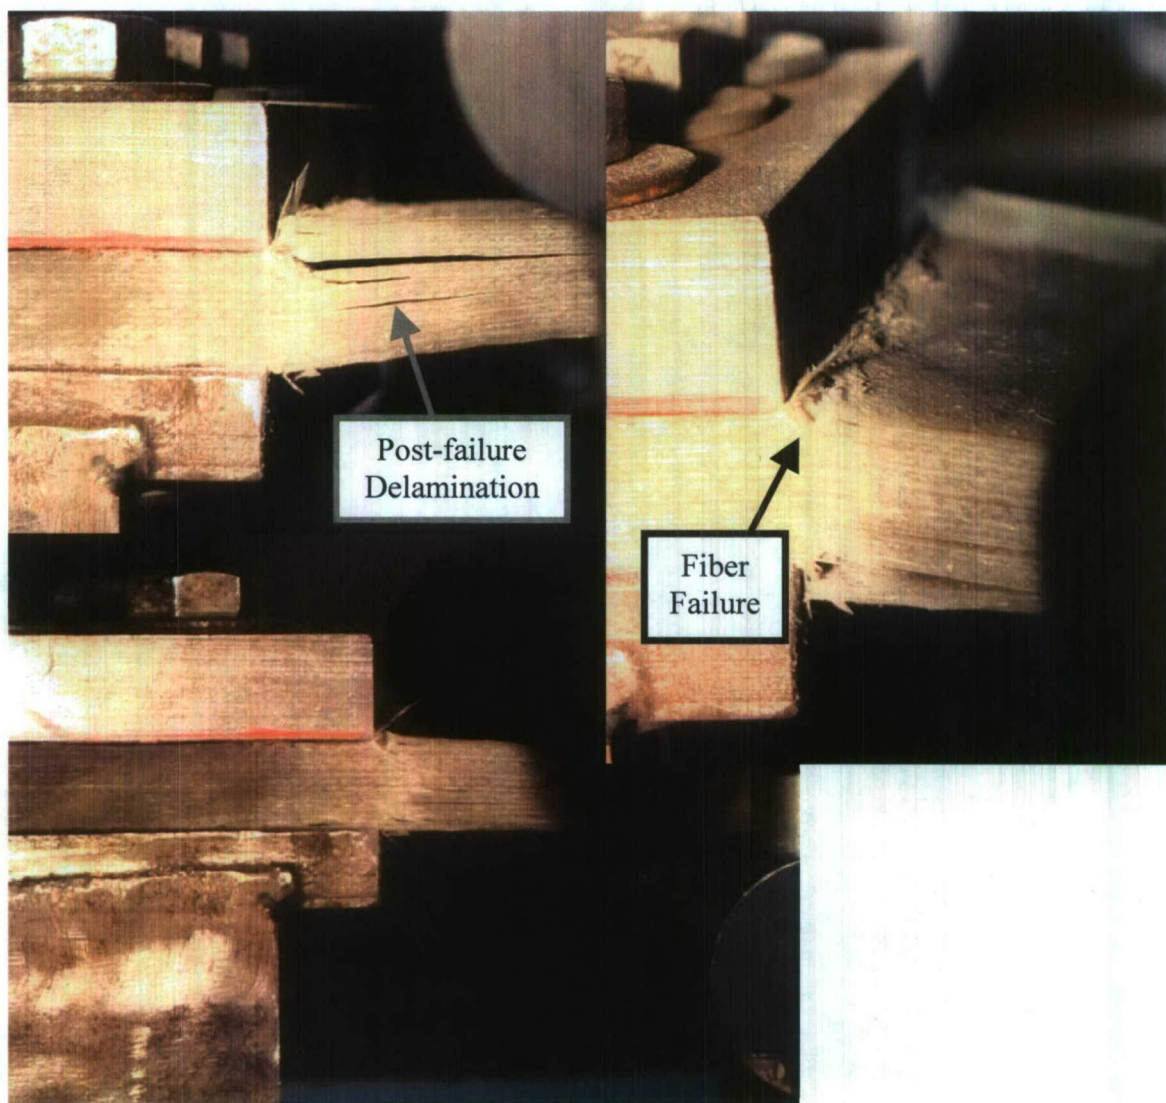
Typical Fatigue Failure in a Standard Bolted Joint (from 8kip Test)
